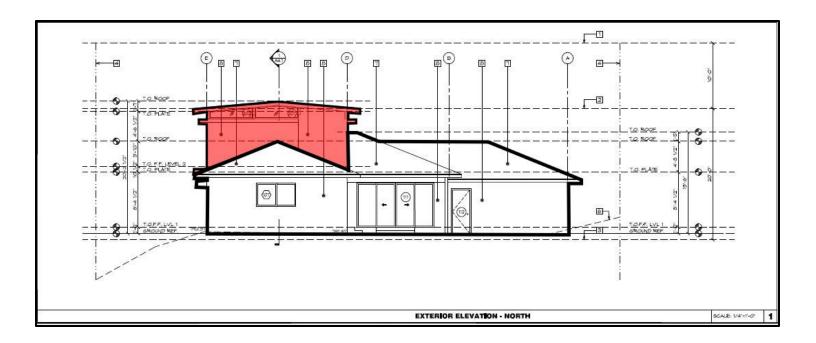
Rear (north) elevation of proposed development with additions shown in red
